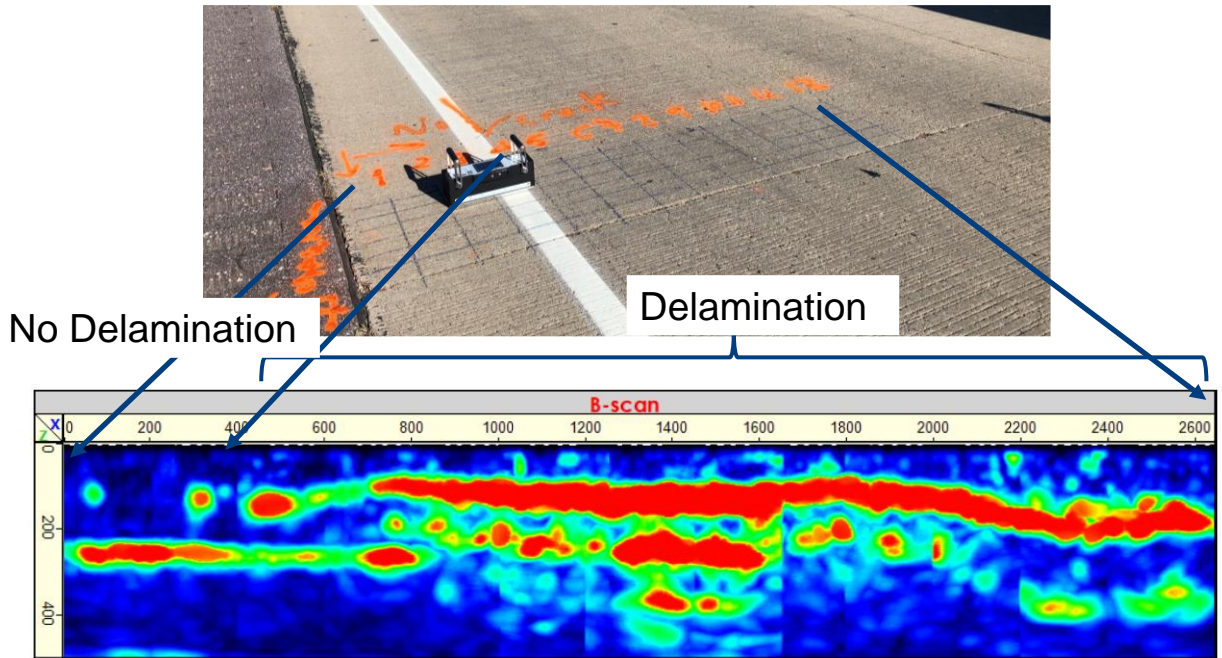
Delamination cracking beneath the surface of the concrete near Site # 4 on I-39.
